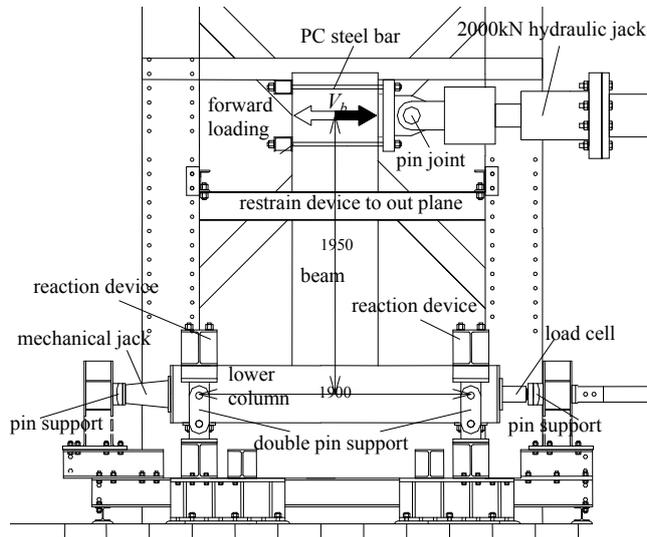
Sub-assembly Specimen for Cyclic Loading Test
